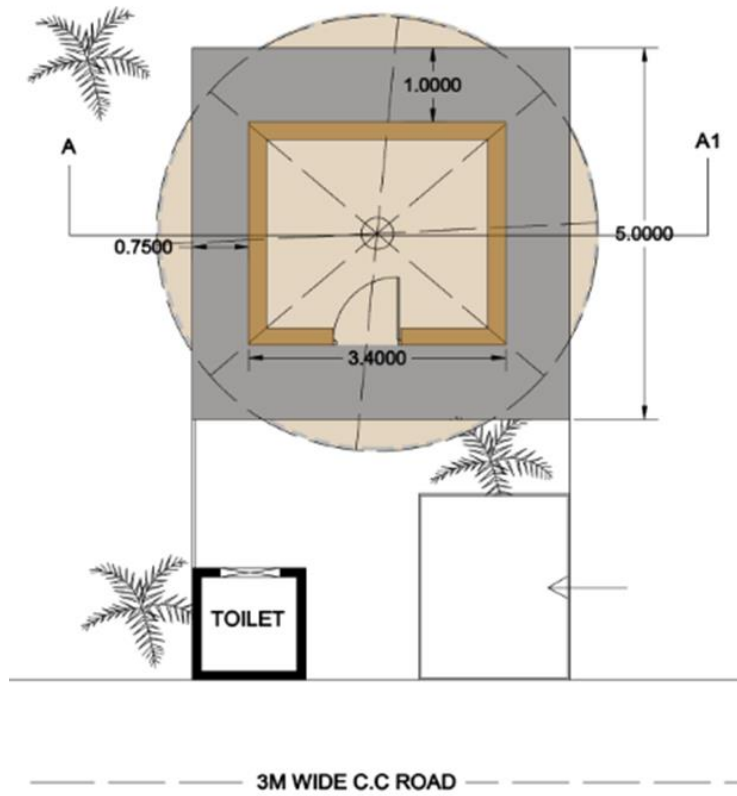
TYPOLOGY – 1(BUILDING LEVEL)
